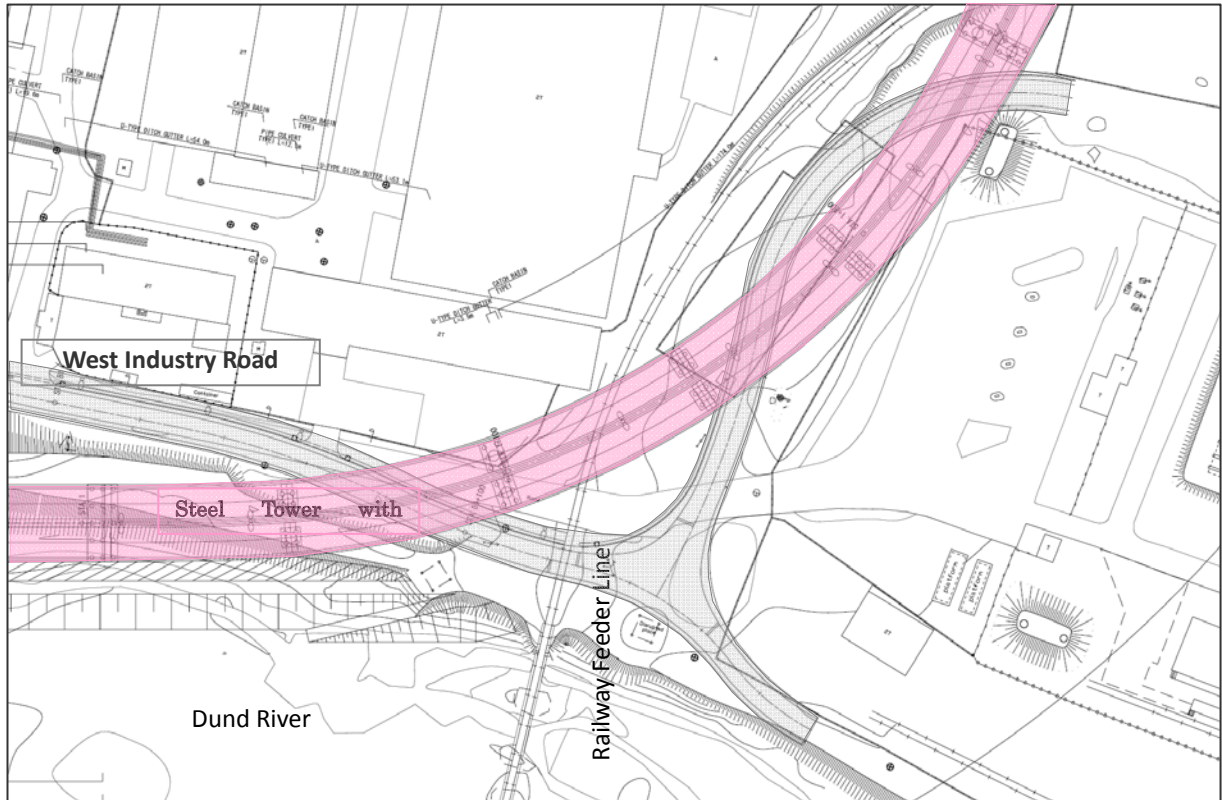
Plan of Intersection with Existing West Industry Road
